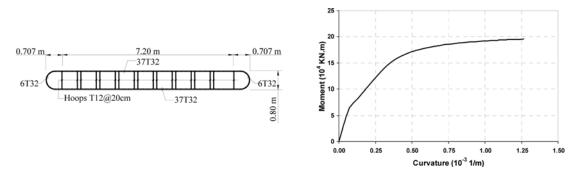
Cross section and its moment curvature curve for the Sample bridge 2 with a wall pier type
